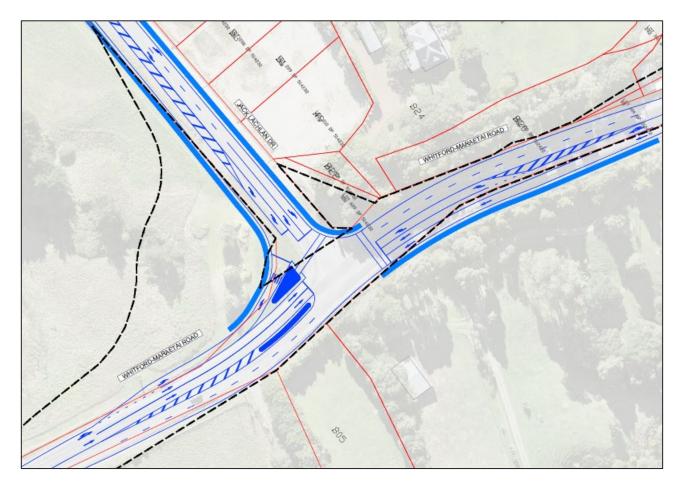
Proposed Upgrade to Whitford Maraetai Road / Jack Lachlan Drive intersection
